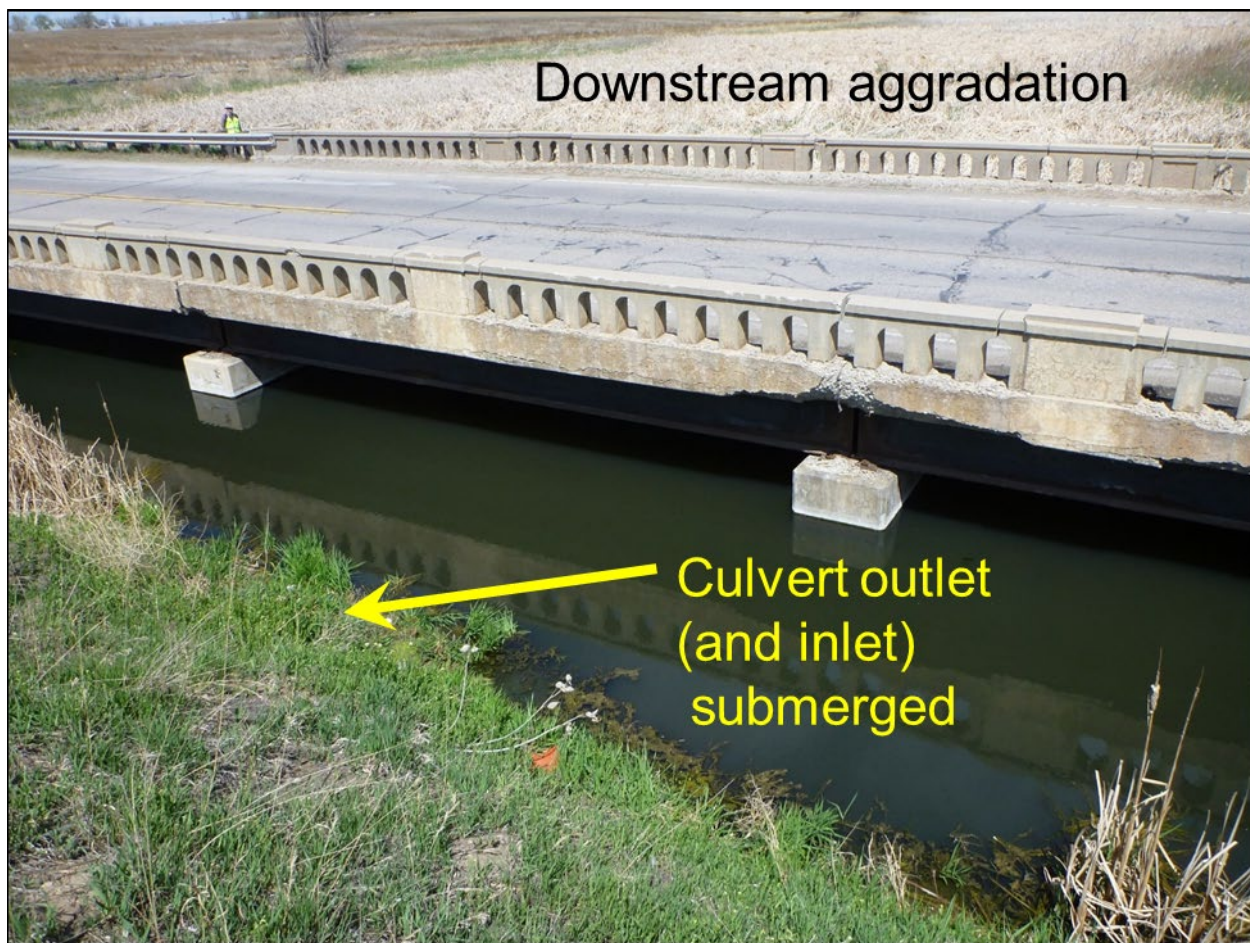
Loss of bridge and culvert capacity from downstream aggradation.
